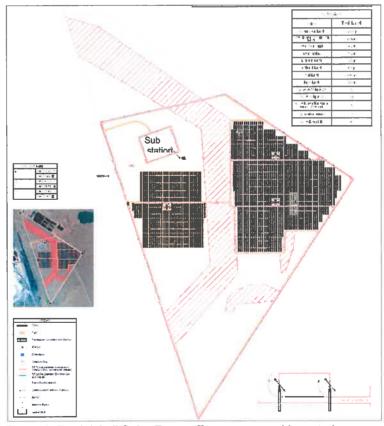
Danielskuil Solar Energy Farm: proposed layout plan
